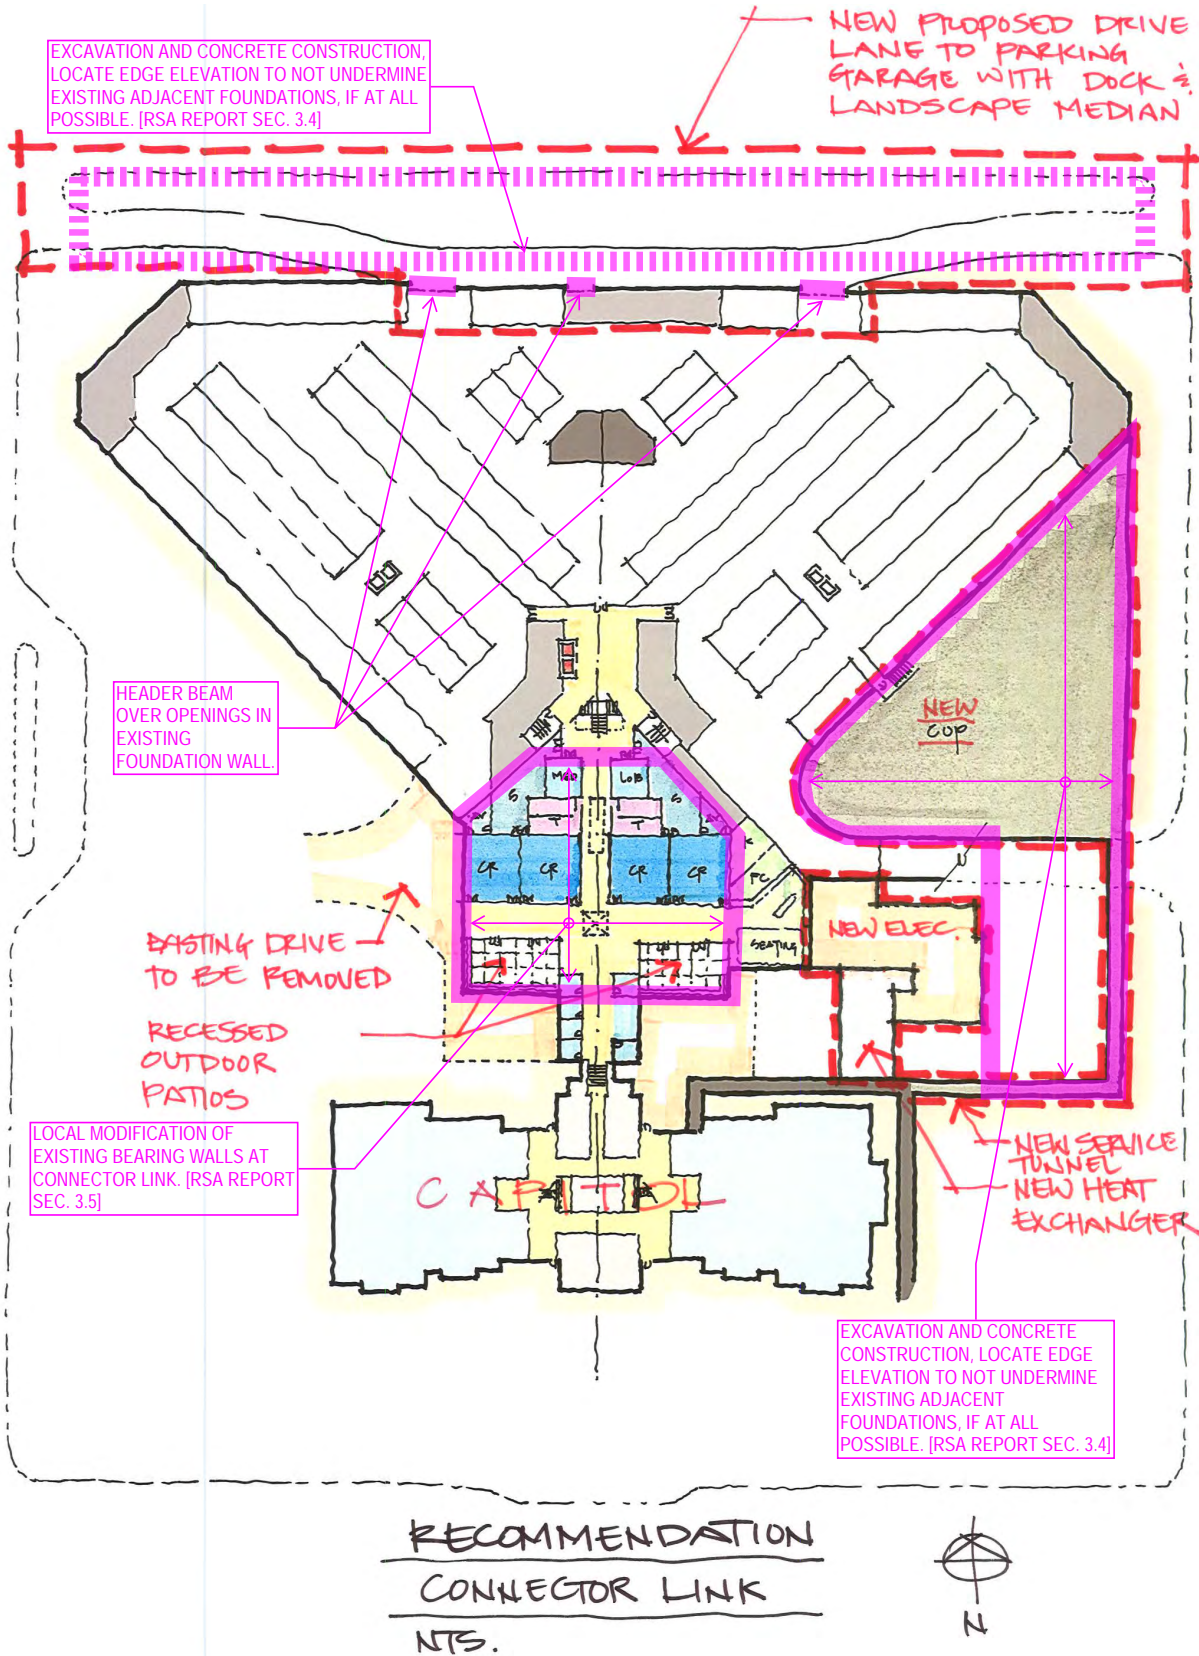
Recommendation Scheme Structural Markups – Basement Floor Plan
